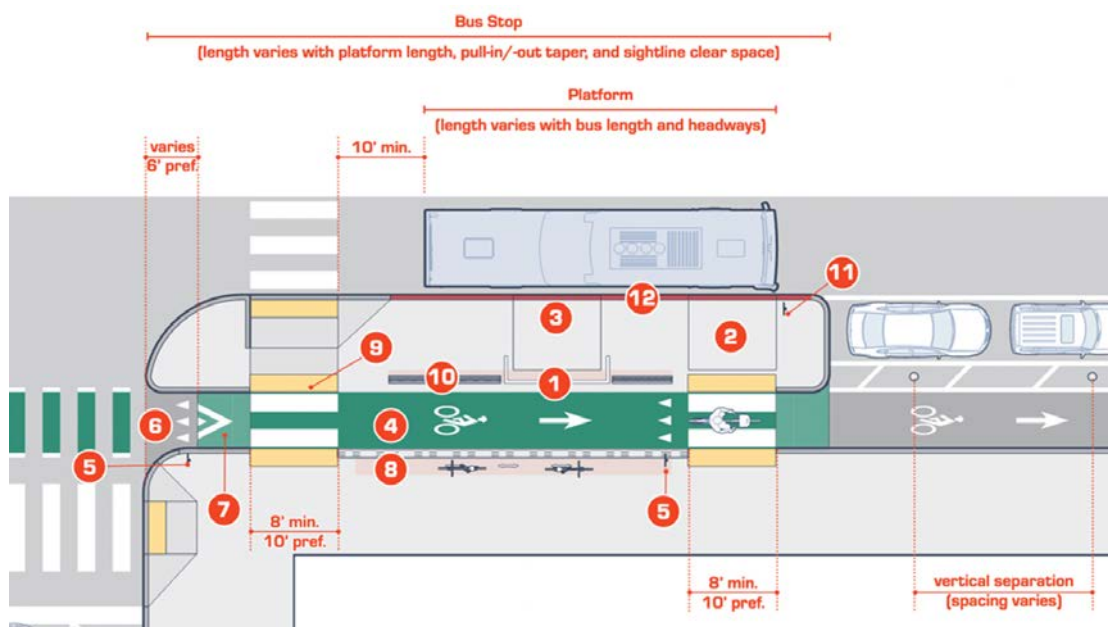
Boarding Island with Protected Bikeway Plan. (Source: AC Transit Multimodal Corridor Guidelines (2018))
